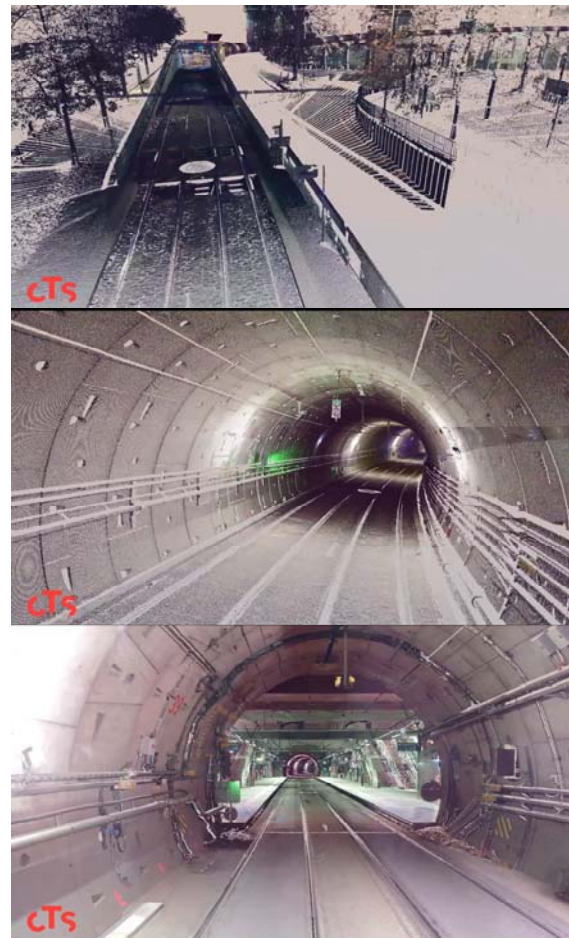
Video of tunnel (a) Entering the tunnel at Rotonde station, (b) Common section of tunnel, (c) Entering the Gare centrale underground station
